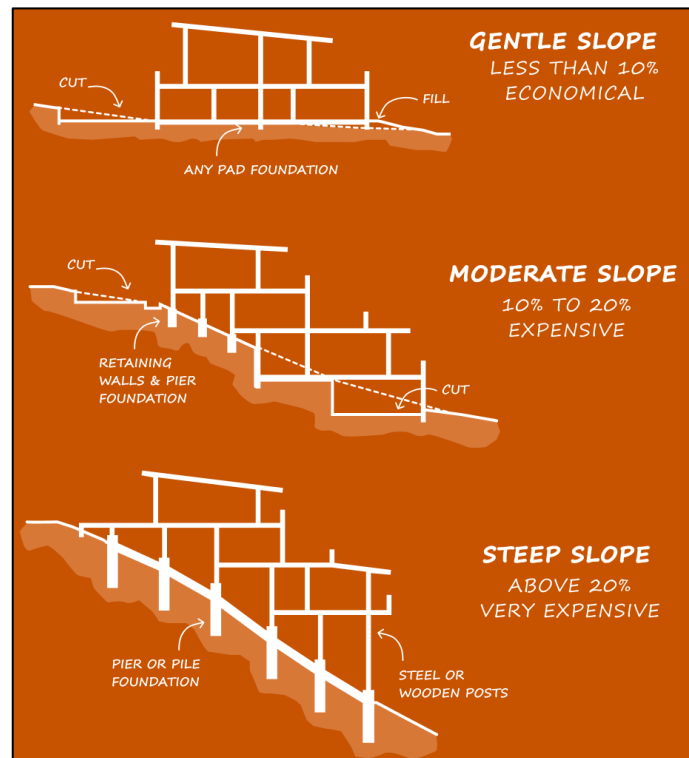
Excavation, backfilling and leveling for building construction on slopes.
